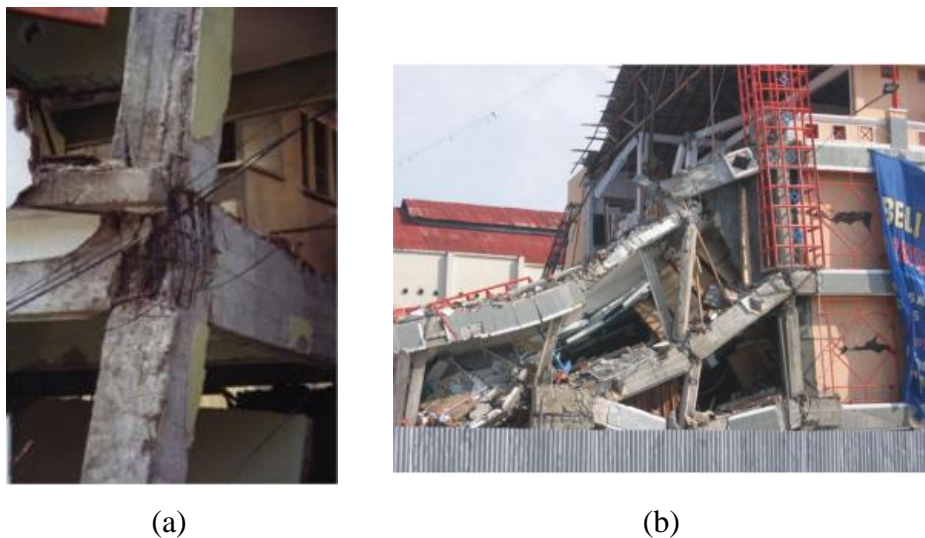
(a) Column beam joint failure and (b) Strong beam weak column failure (Saatcioglu, 2013)
